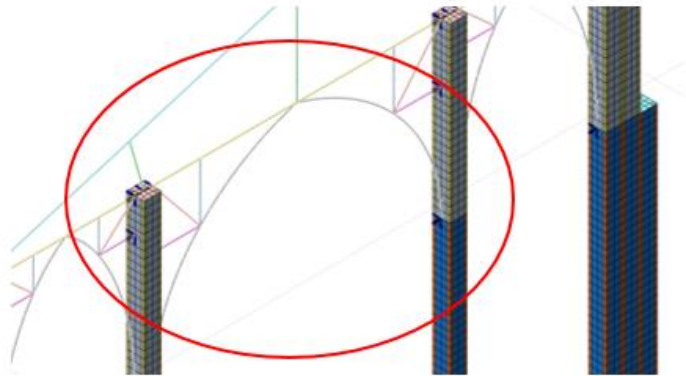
Beam elements at the top of the vaults beams and reinforcement bars.
